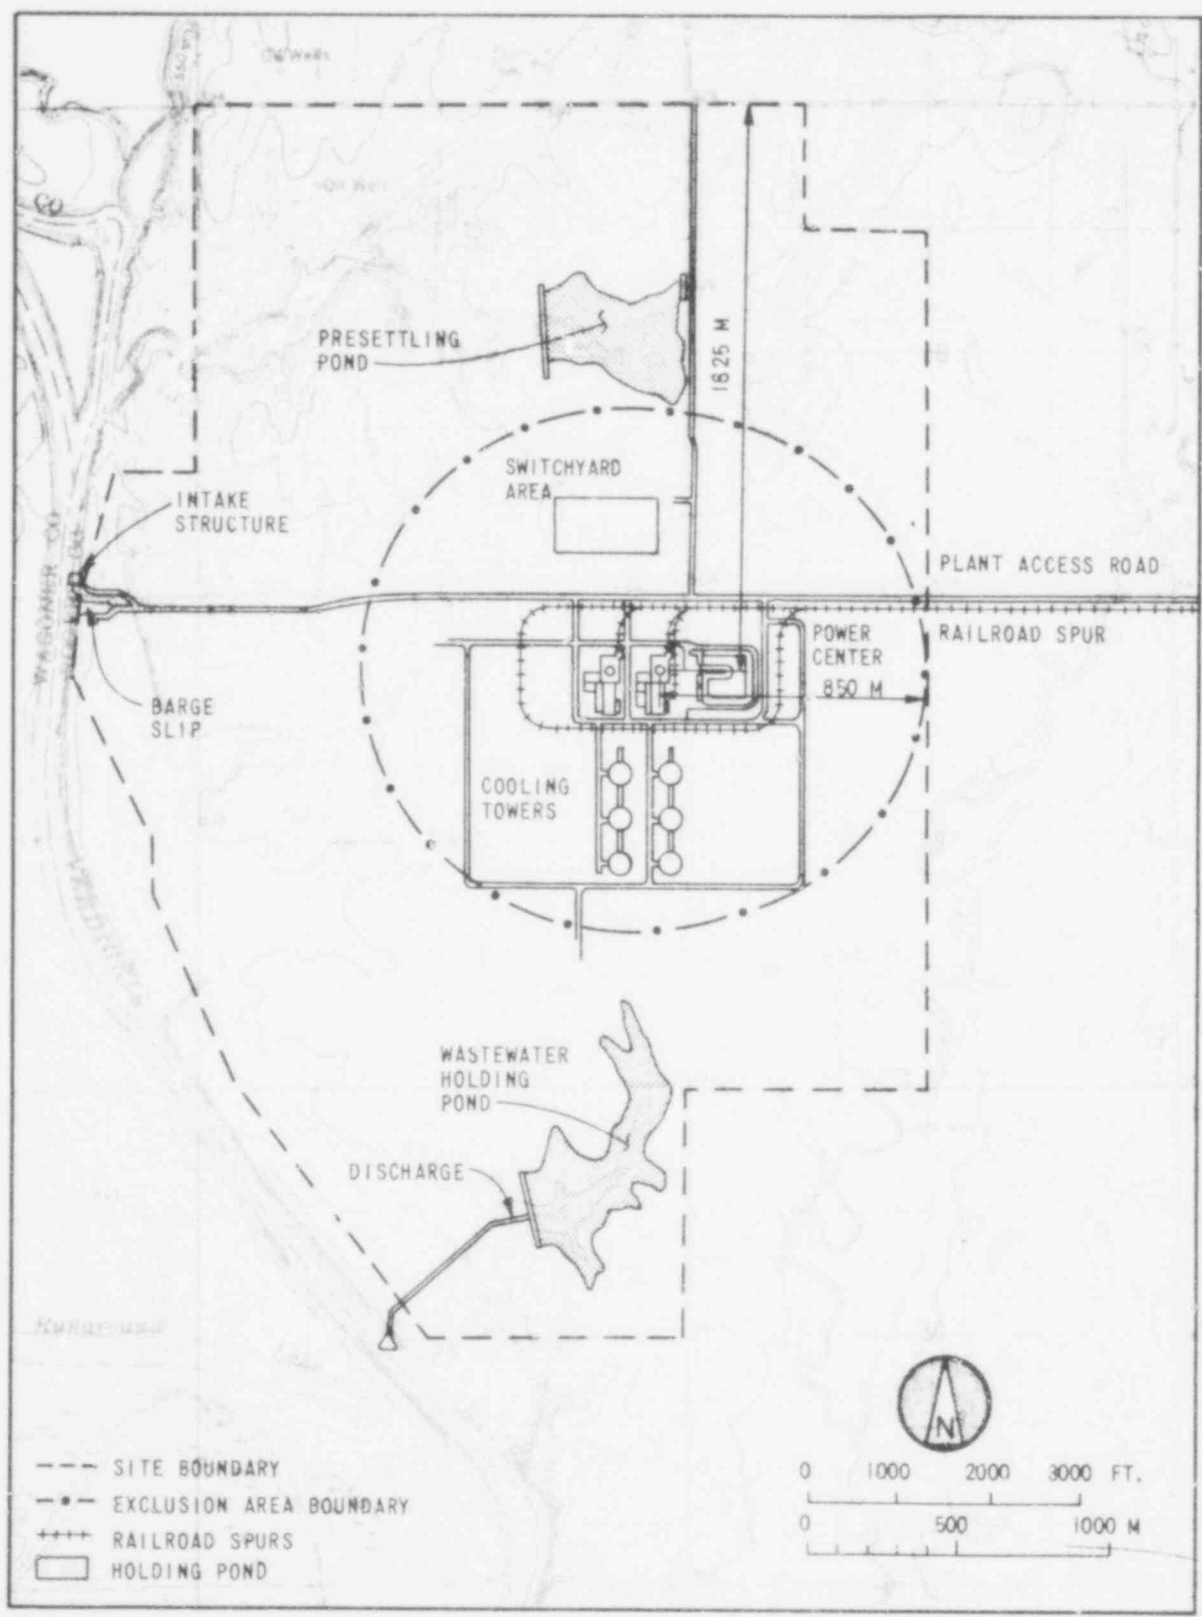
Black Fox Plant Arrangement. From ER, Fig. 2.1-3.
